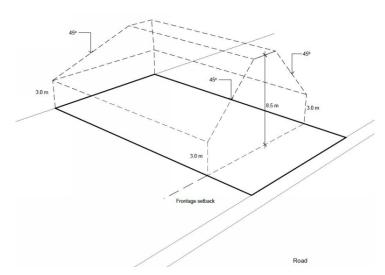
Building envelope as required by clause 8.4.2 A3(a) and clause 8.5.1 A2(a)
